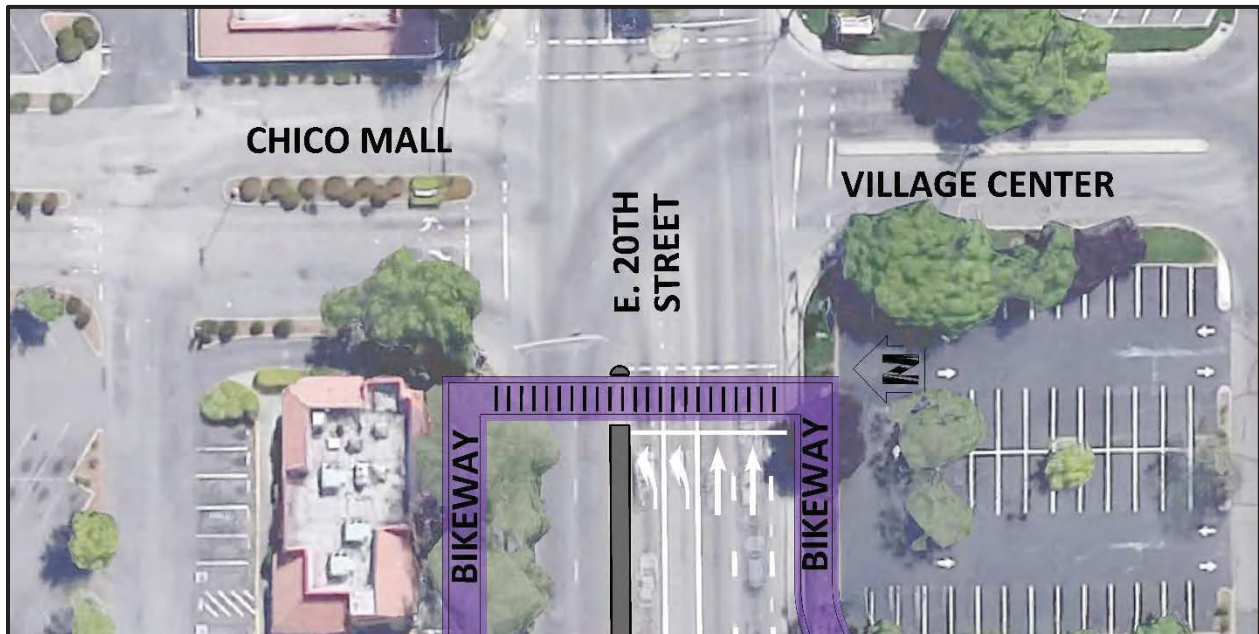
PROPOSED AT-GRADE CROSSING ALTERNATIVE 2 AT 20TH STREET AND SR-99 RAMPS
